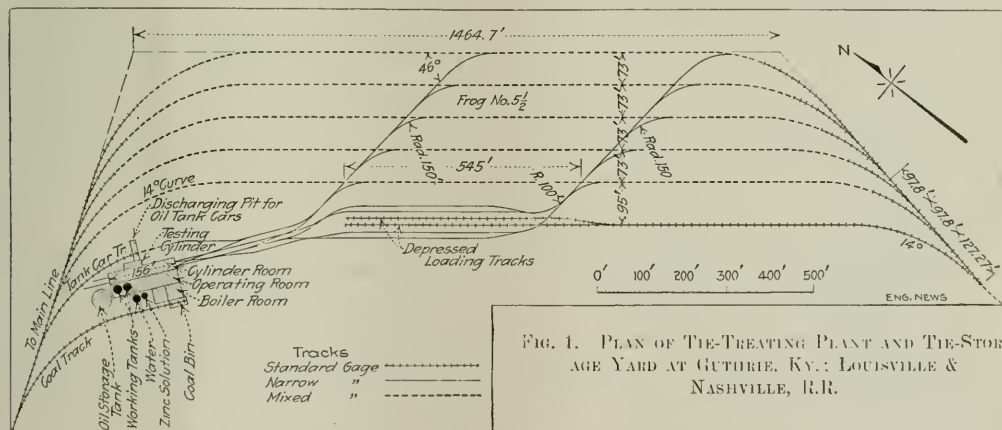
PLAN OF TIE-TREATING PLANT AND TIE-STORAGE YARD AT GUTHRIE, KY.; LOUISVILLE & NASHVILLE, R.R.
